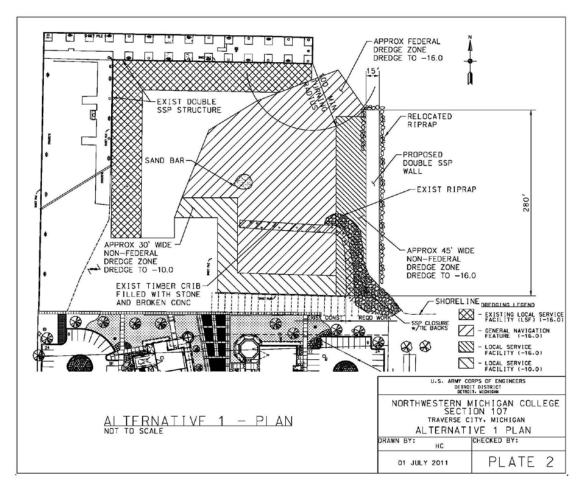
Plan view of the double sheet pile breakwater alternative, this also represents the locally preferred plan.
